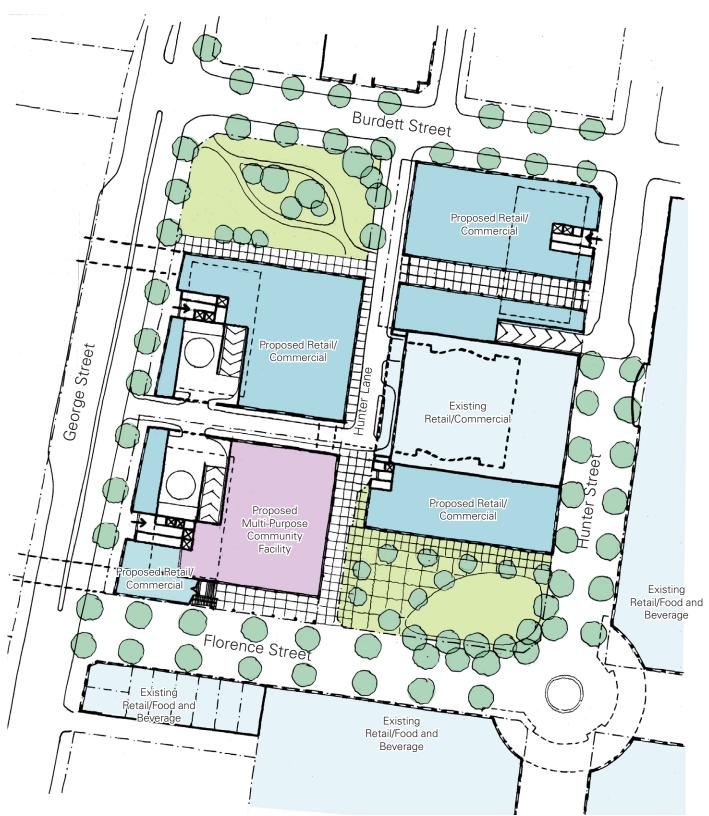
Proposed configuration of multi-purpose community facility and surrounding uses (Ground Floor Plan and Uses)
